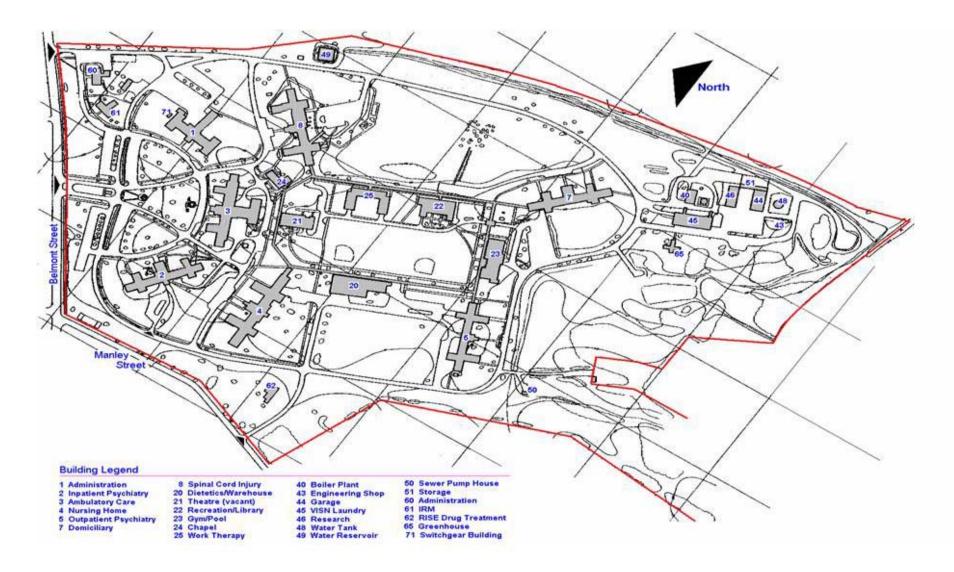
BPO 1 Site Plan - Jamaica Plain VAMC
